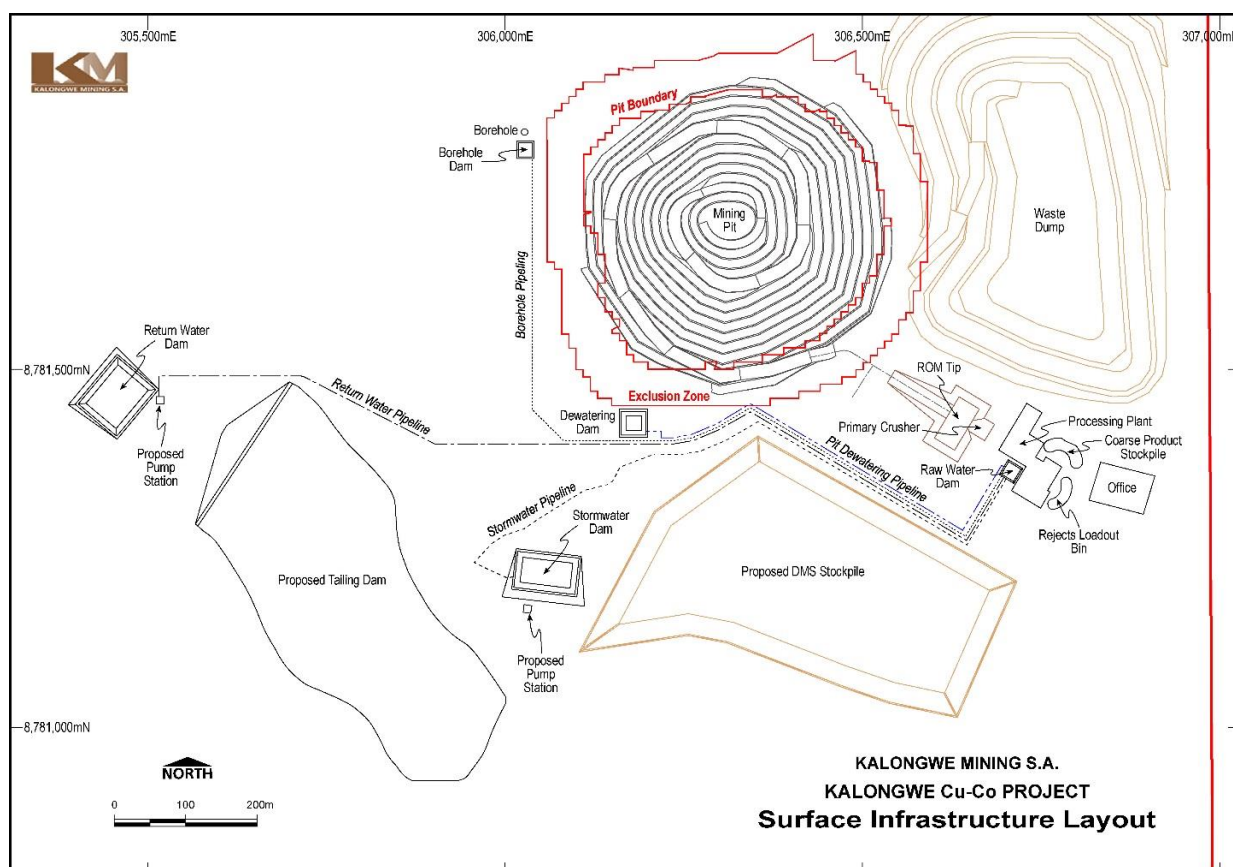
Shows the plant and site layout including the plant, plant services, infrastructure and mine layout.
